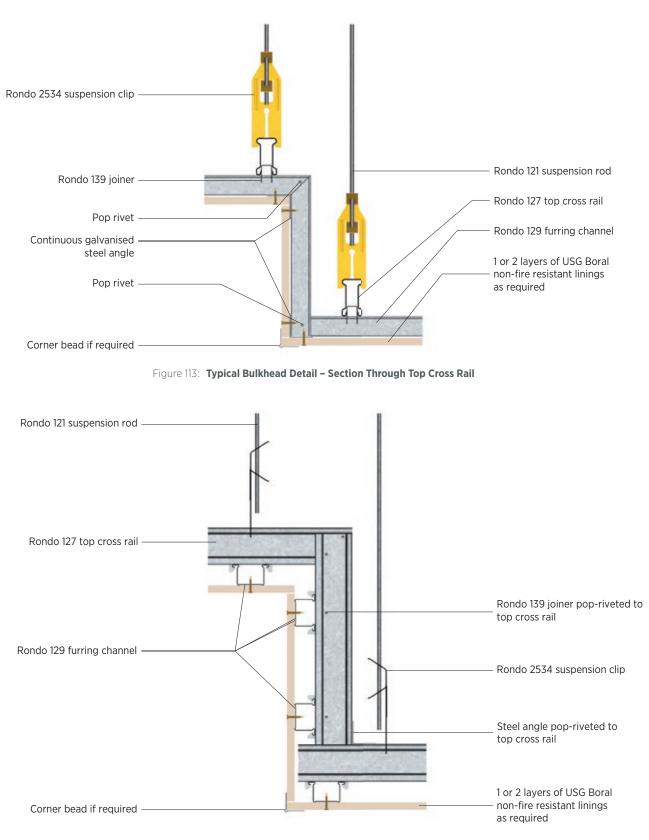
Typical Bulkhead Detail – Section Through Furring Channel
